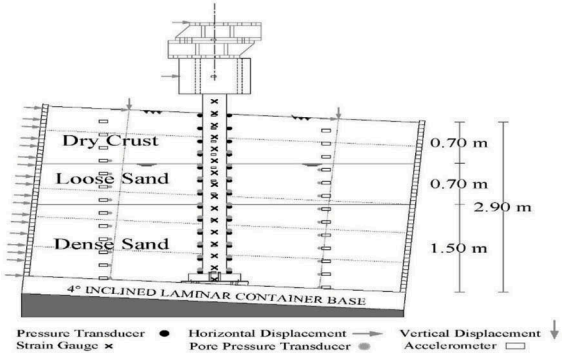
Medium laminar container after extension to 2.90 m high test layout (test 5)
